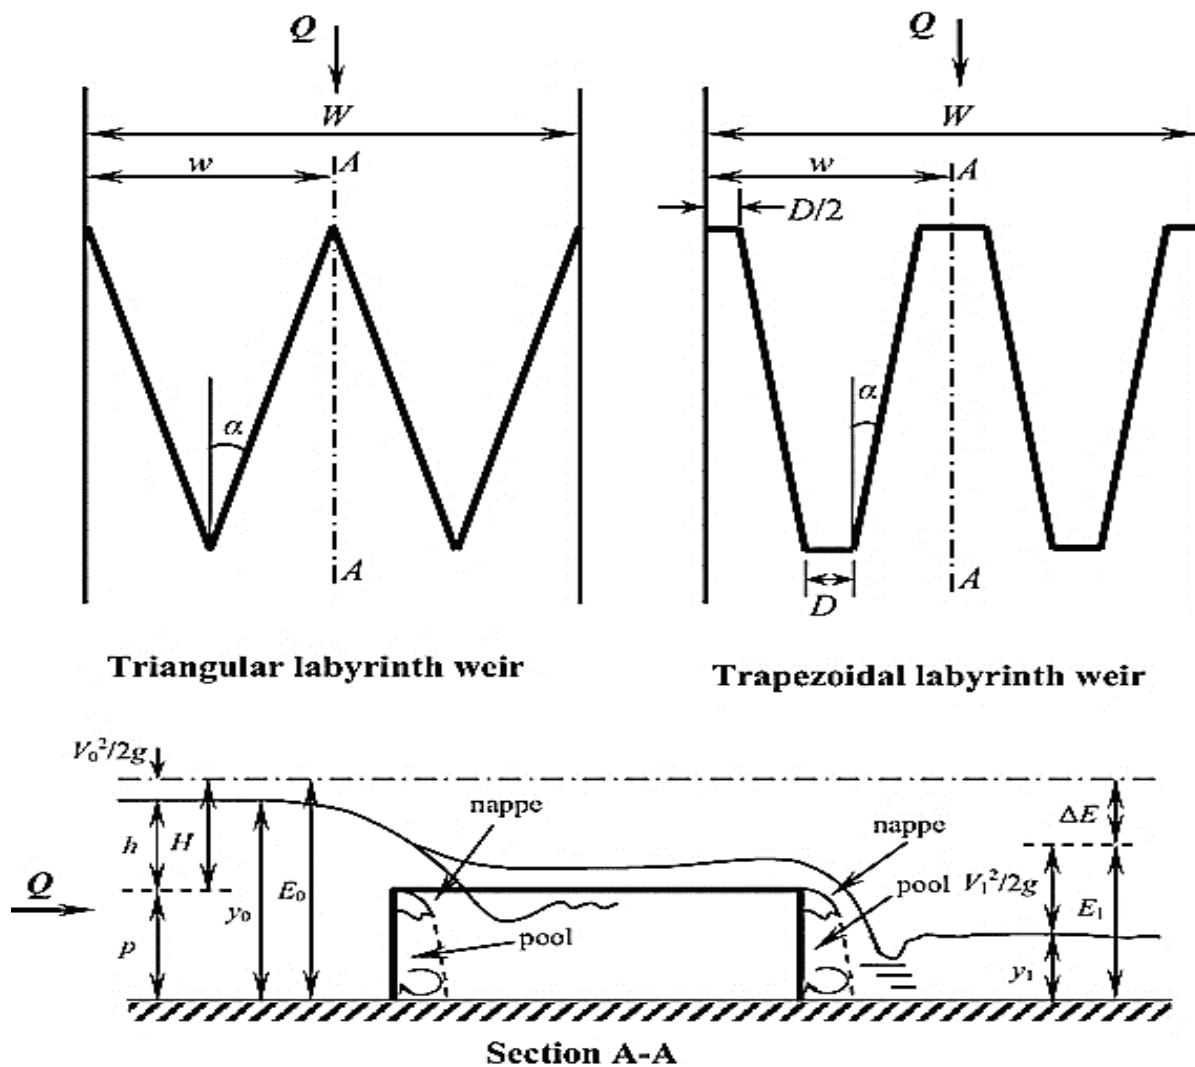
Geometric and hydraulic parameters of triangular and trapezoidal labyrinth weir plan.
